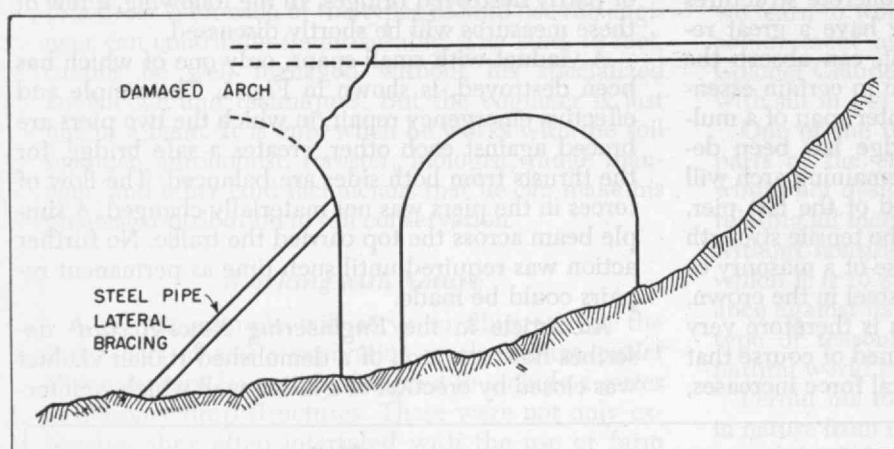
East end of Kaempfelbach viaduct, after war damage, is braced with four parallel steel pipes whose purpose is to conduct side thrust on remaining arch safely to ground, as shown at left.
